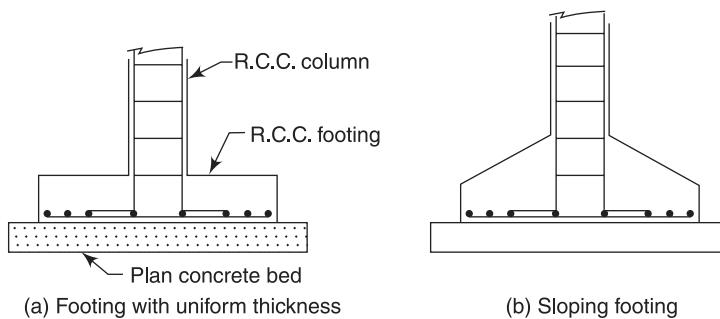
Reinforced Concrete Structures – Footings and Columns
